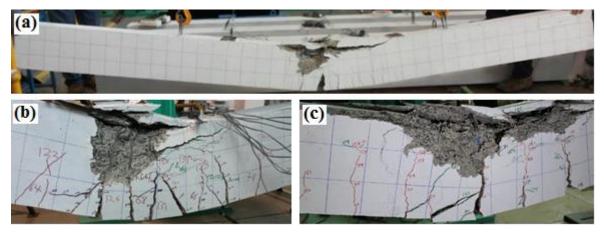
Failure modes of the beams; (a) Beam A; (b) Beam B and (c) Beam C
